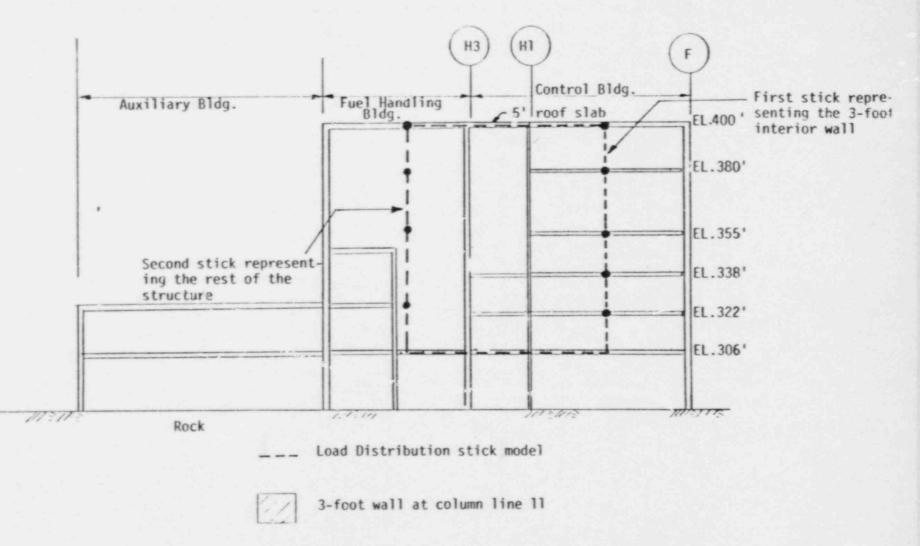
CONTROL BUILDING LOAD DISTRIBUTION MODEL
